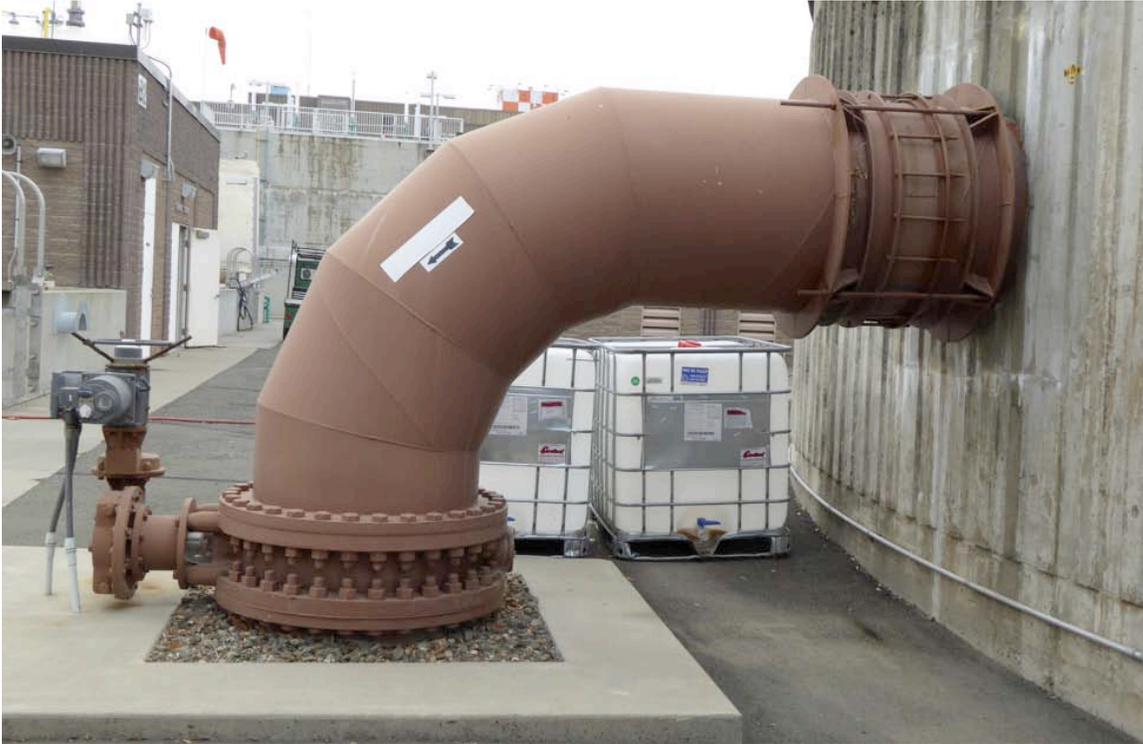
Steel Pipe with Dresser-Type Coupling
